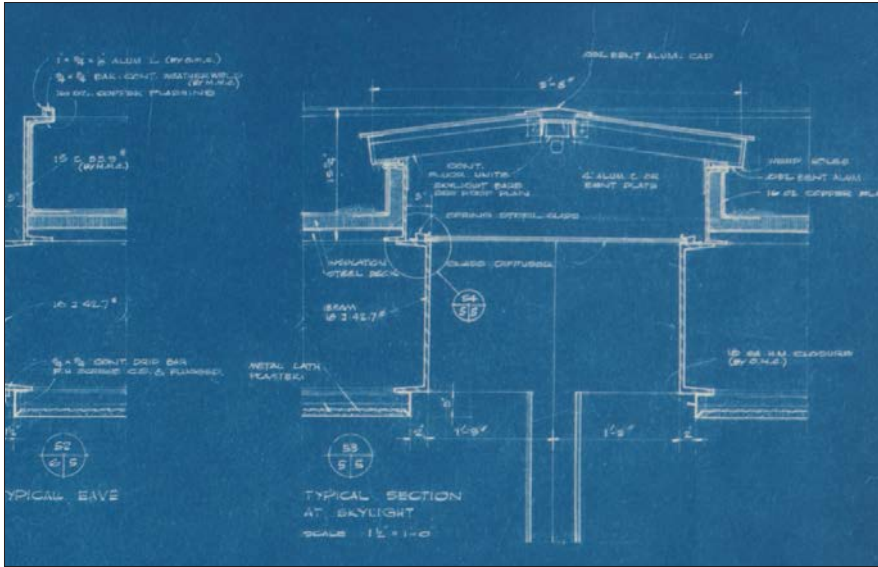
Sections of roof assembly at eave fascia and parapet and at skylight from Sheet A5. Date: February 18, 1955. Credit: MHG\_Illa\_FF041\_010, Miller House and Garden Collection (M003), Newfields Archives
